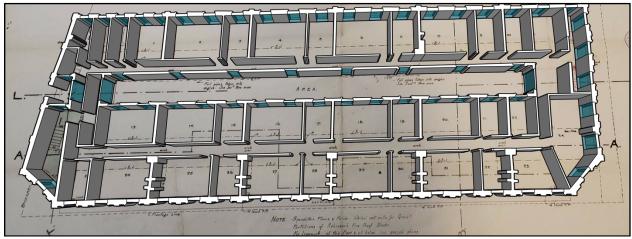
A direct overhead of the fourth-floor model. You can see the architectural plans under the model, which I have built up from.
